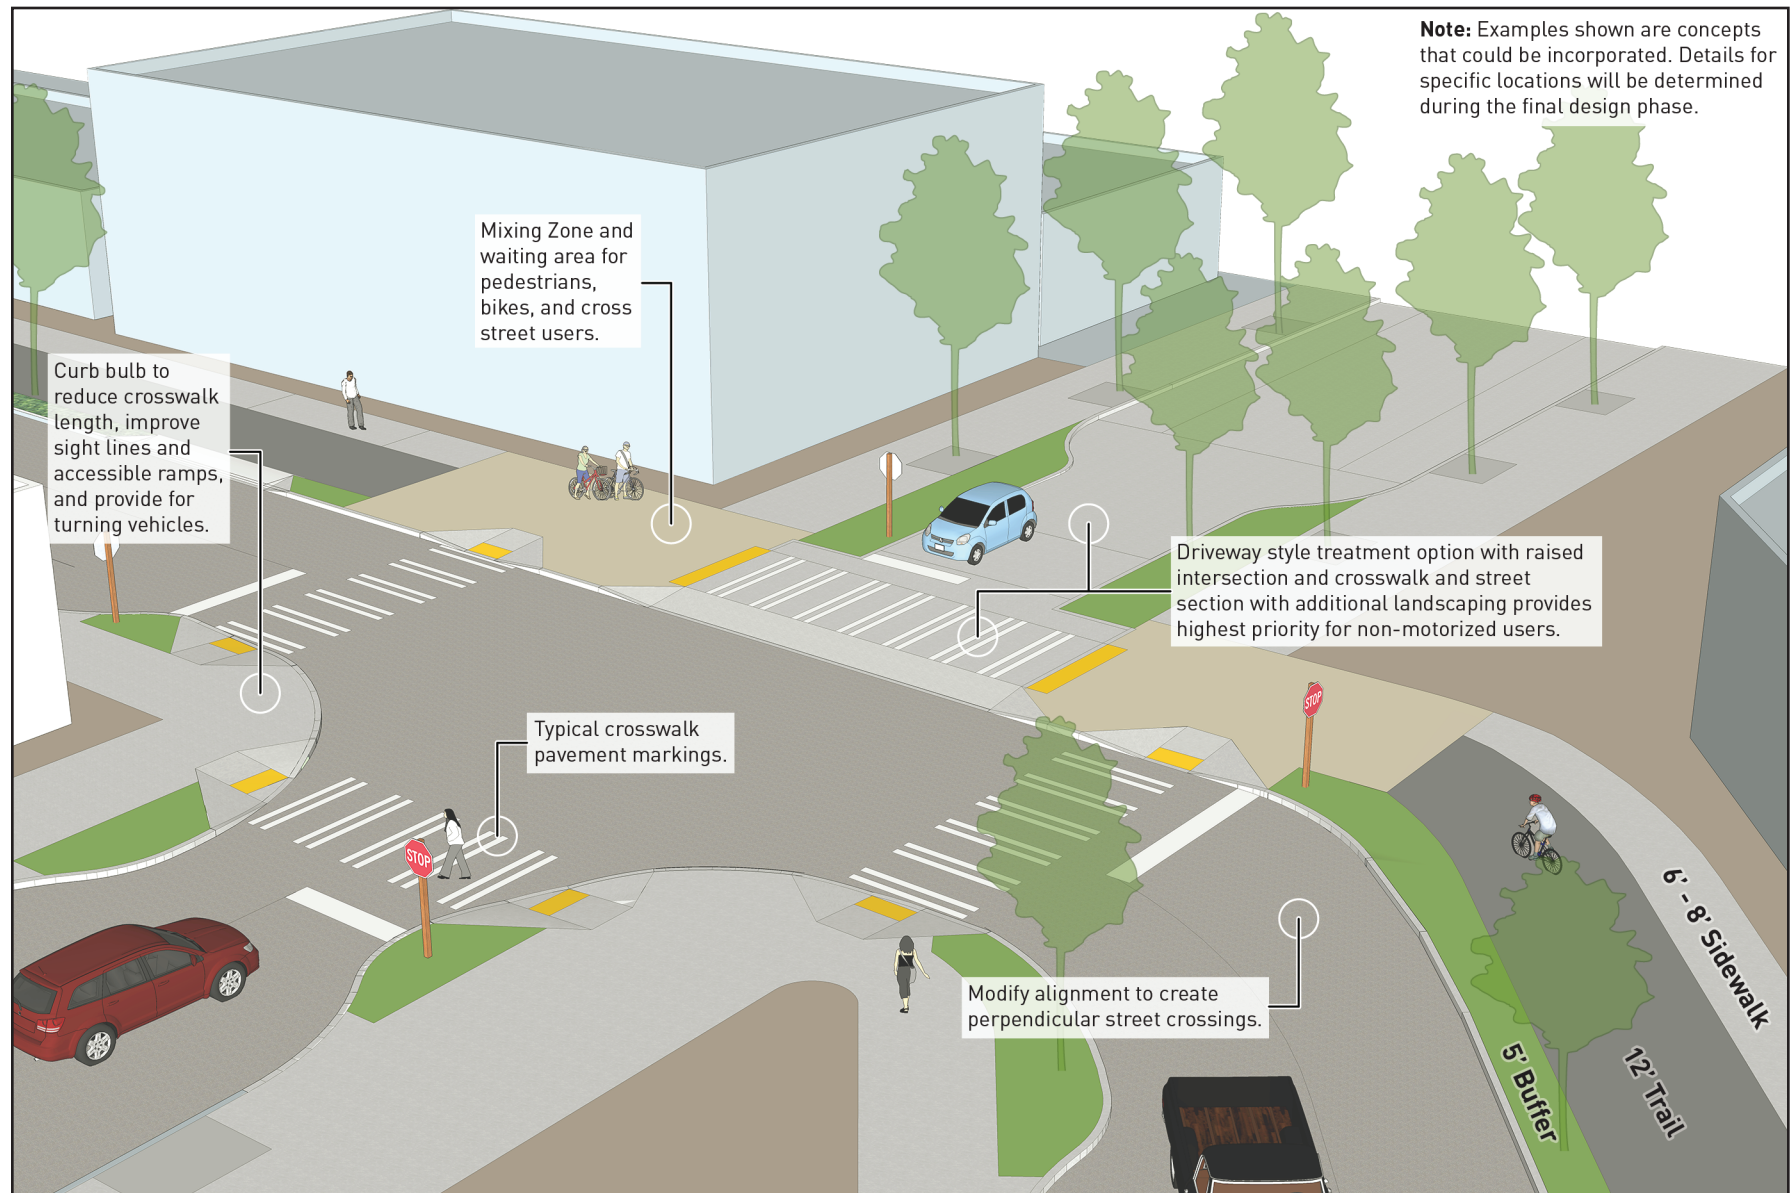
Intersection Design Options: Driveway Style Intersection
